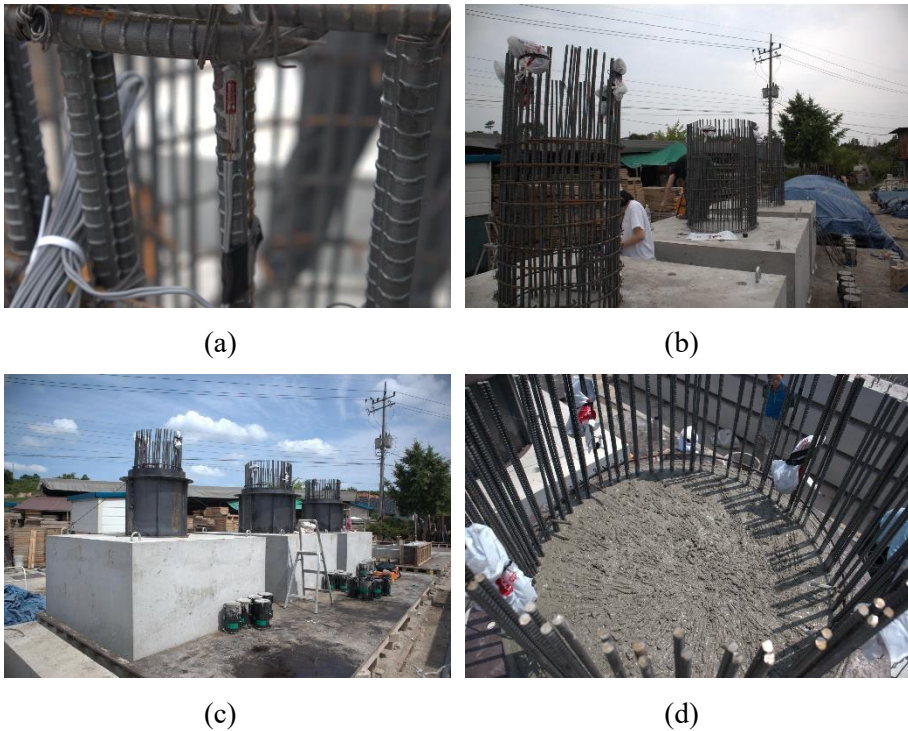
Procedure of column fabrication: (a) Installation of gauges; (b) Sorting and waterproofing of gauges; (c) Installation of molds; (d) Placing and finishing
